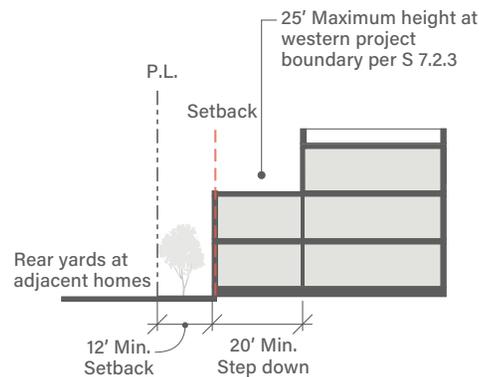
Type D – Townhouses Side/Rear Yard Setback
